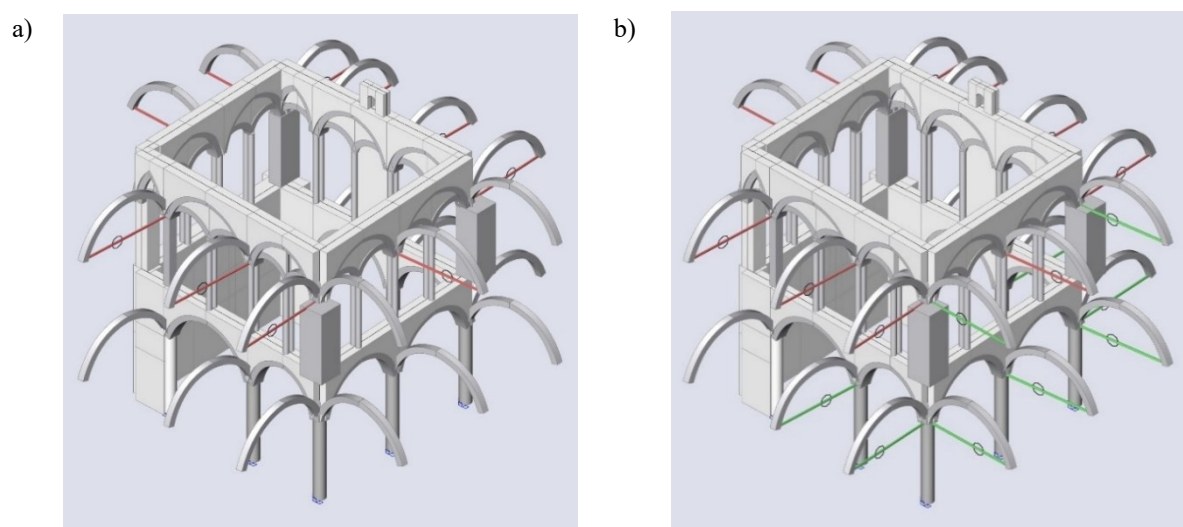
Retrofitting of Rector's Palace Atrium Completed in 2015–2017: a) condition before and after the 1982–1984 restoration with the existing steel ties at the atrium floor level (red); b) condition after the 2015–2017 restoration with the newly installed steel ties at the springing points of the atrium cross vaults (green) [8]
